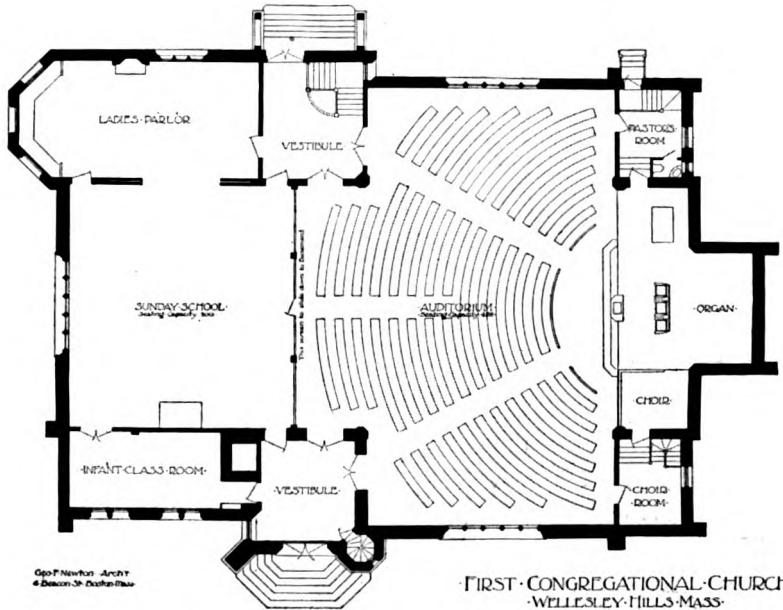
FIRST CONGREGATIONAL CHURCH, WELLESLEY HILLS, MASS. GREEK CROSS PLAN AUDIENCE HALL.
